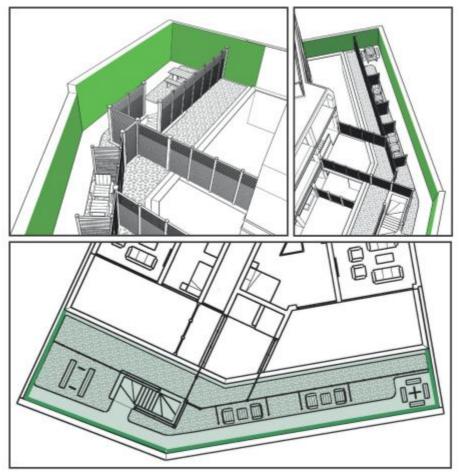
97m2 of Planted Green Wall Along the Back Garden Wall of the Development
